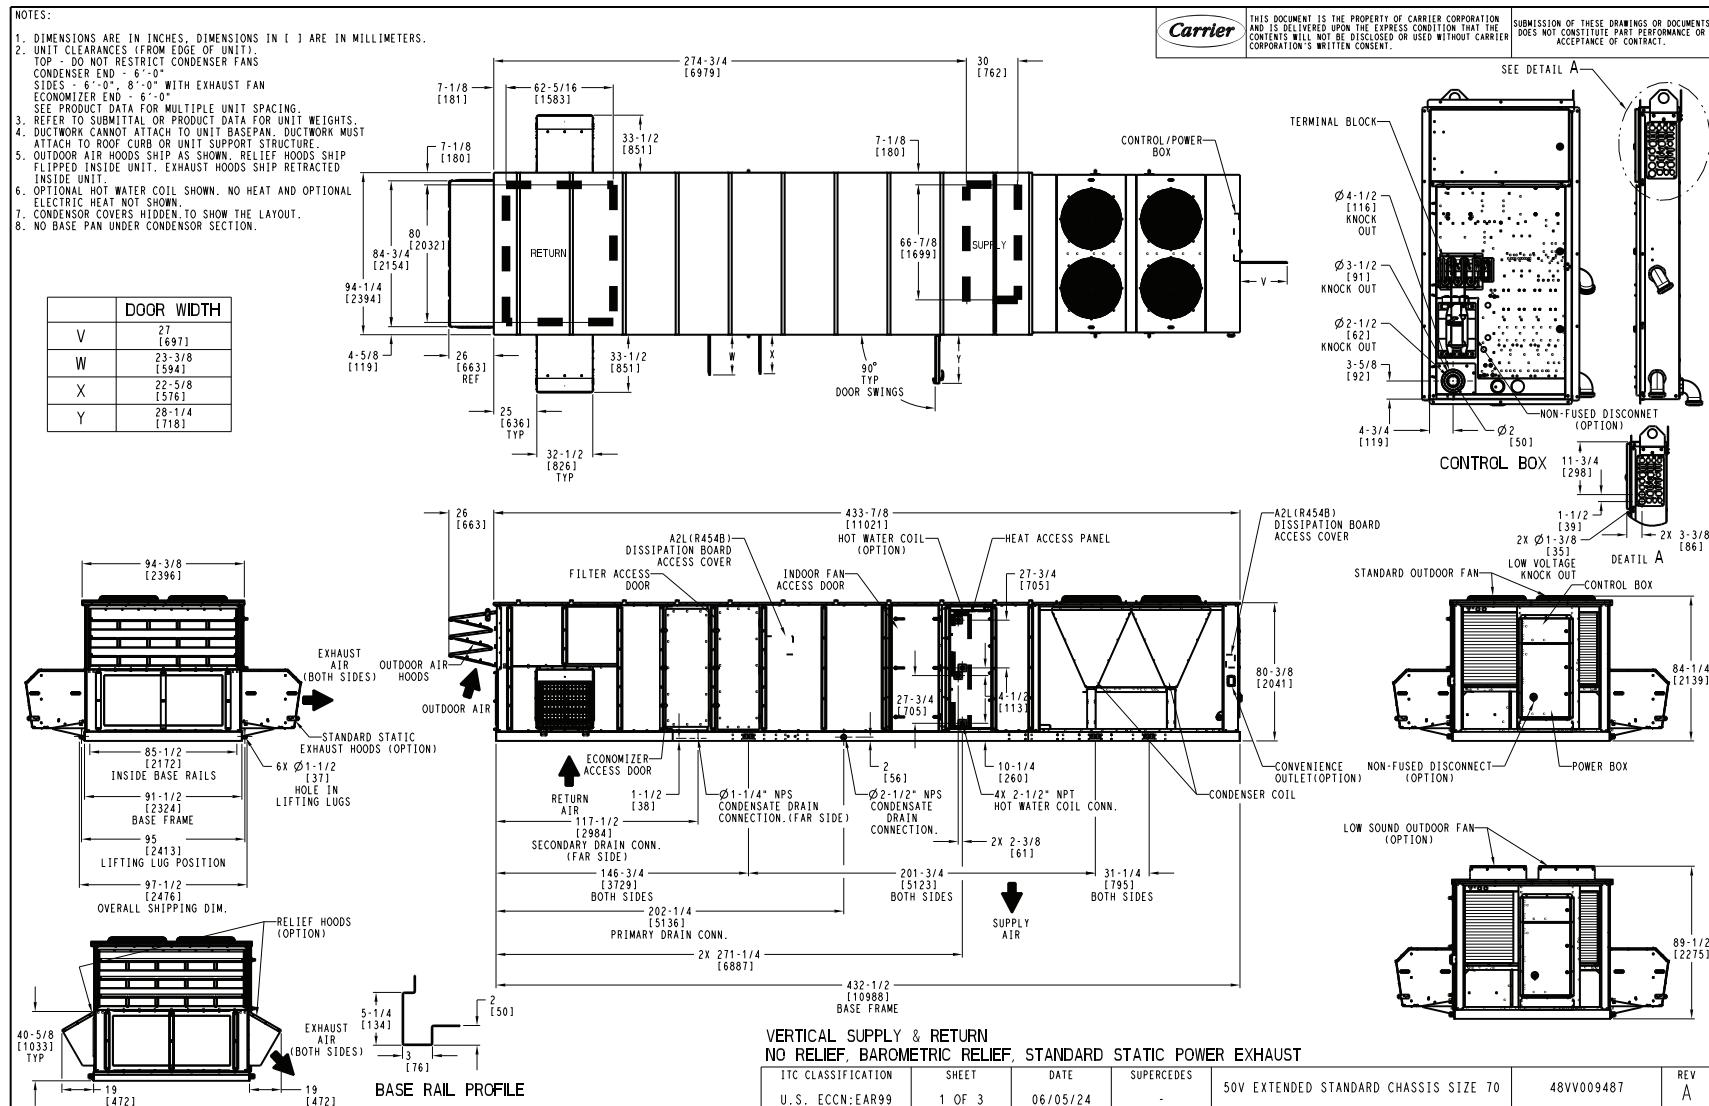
50V 70 Ton Extended Standard Chassis
